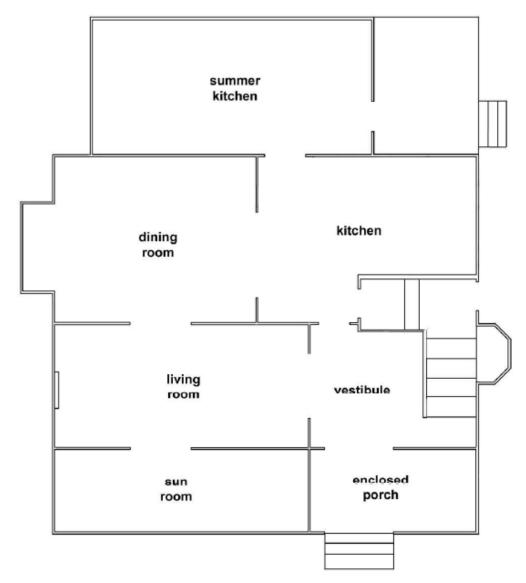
Ground Floor Plan (CHC Limited 2017: 13)
